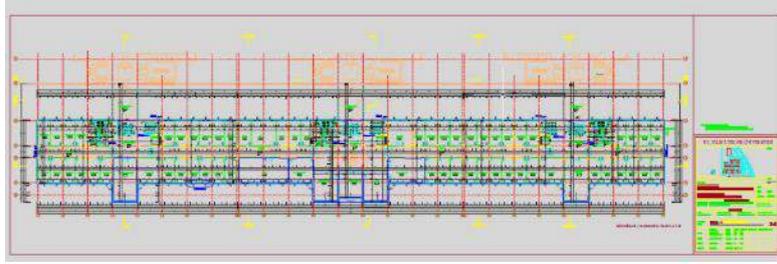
The architectural plan of the Faculty of Civil Engineering on its 2nd floor
